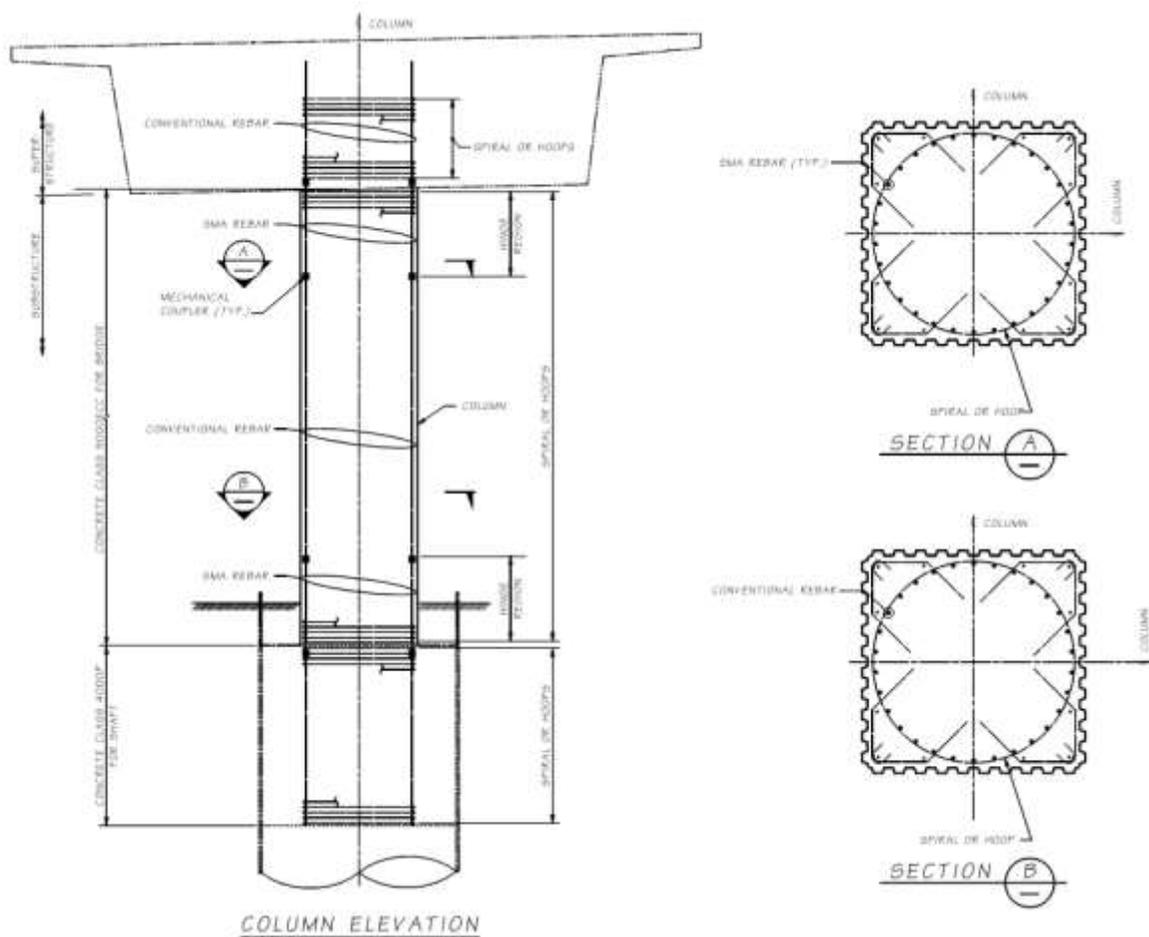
Shape Memory Alloy and Engineered Cementitious Column (Elevation and Sections)
